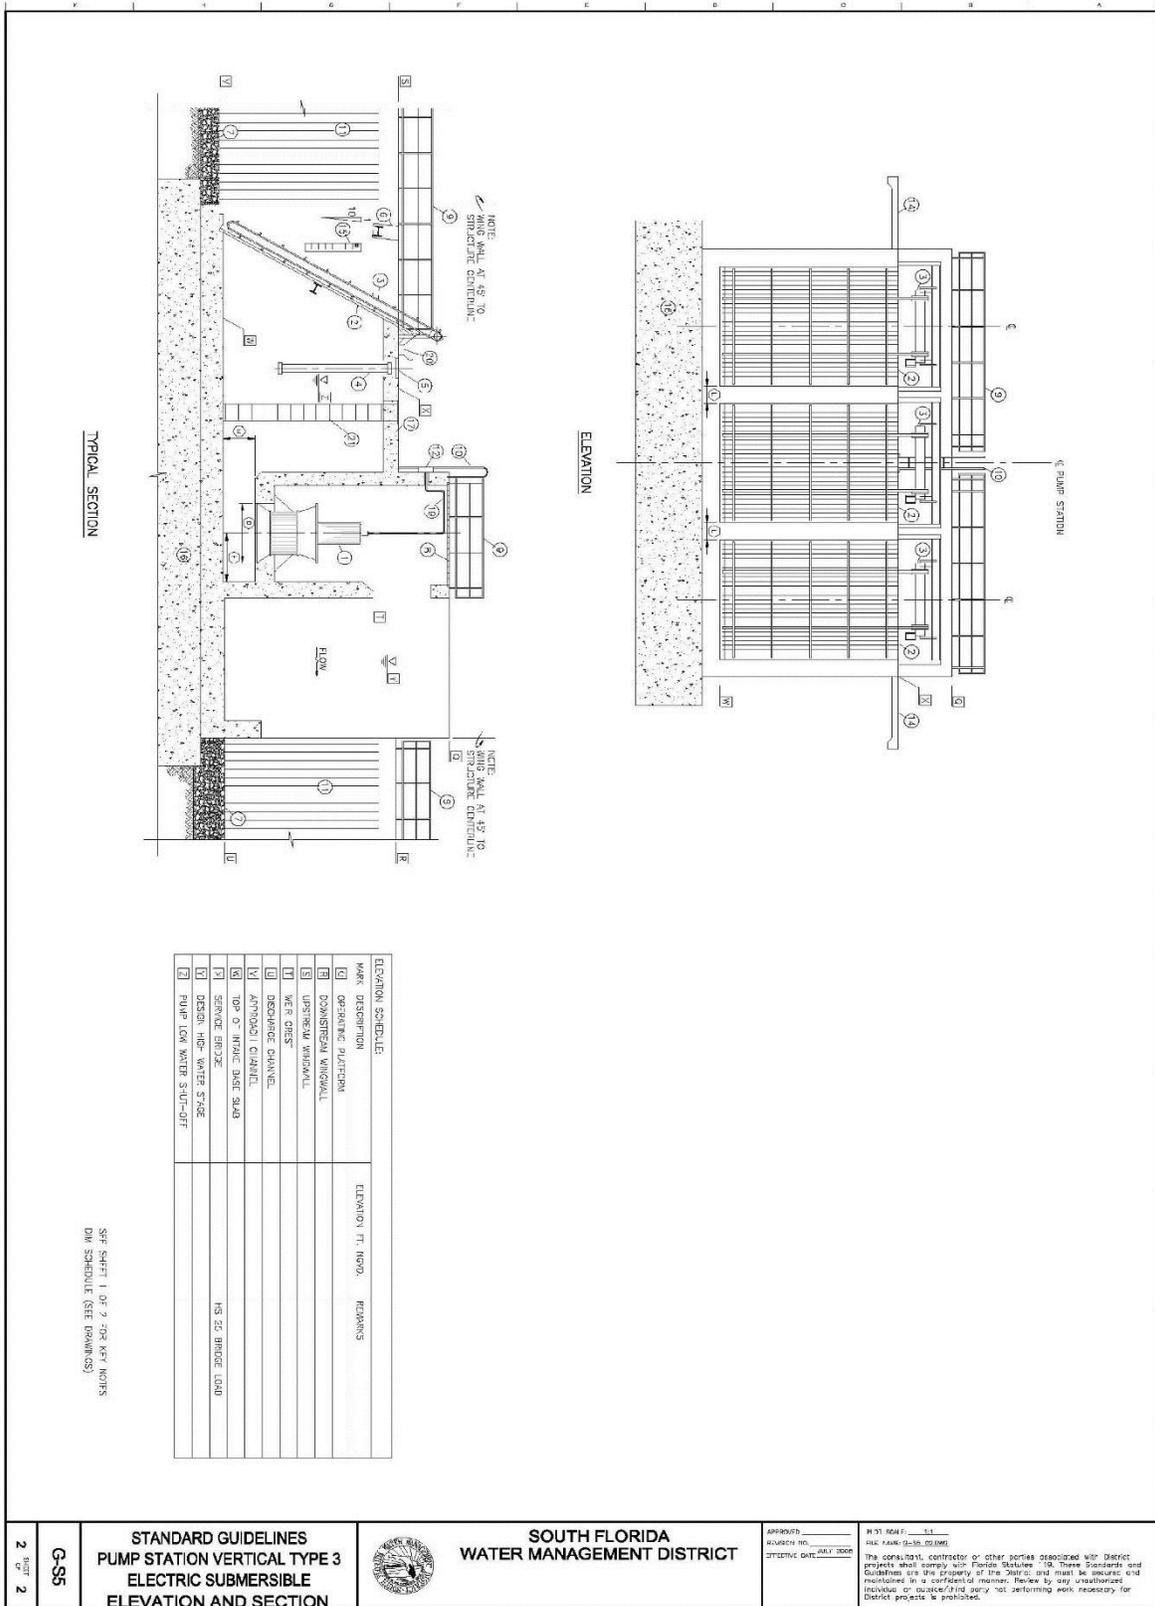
Standard Guidelines: Electric Pump Station, Vertical Type 3 Submersible Elevation and Section
